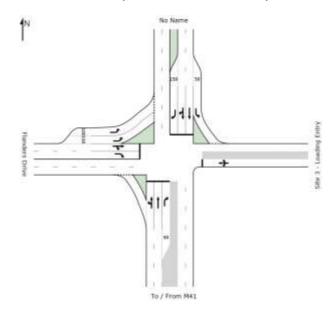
Future layout of the Flanders Drive and Flanders Drive (to / from M41) Intersection
